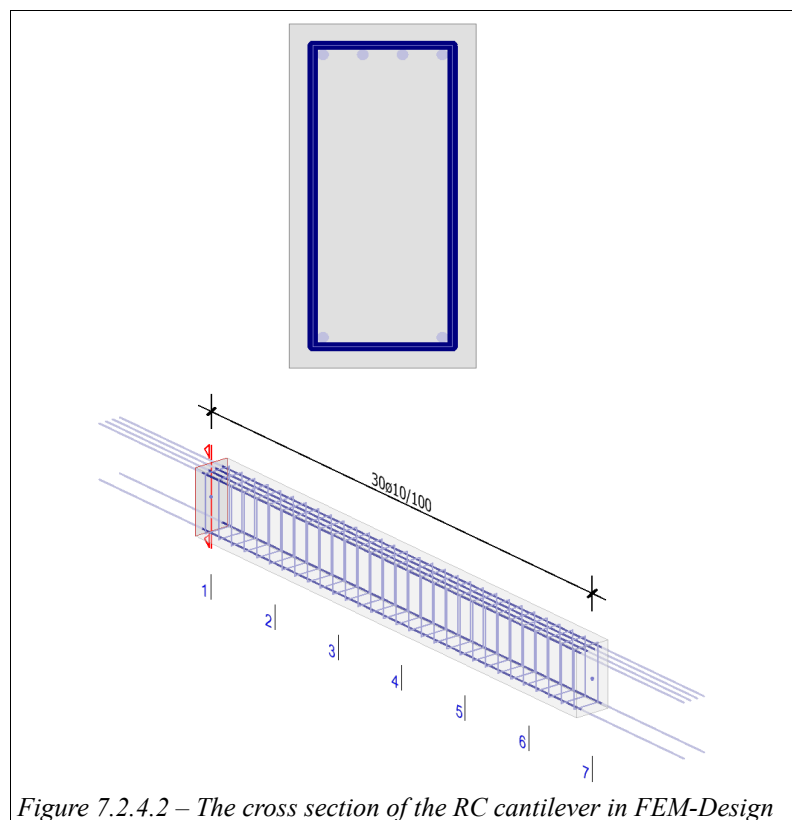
The cross section of the RC cantilever in FEM-Design
